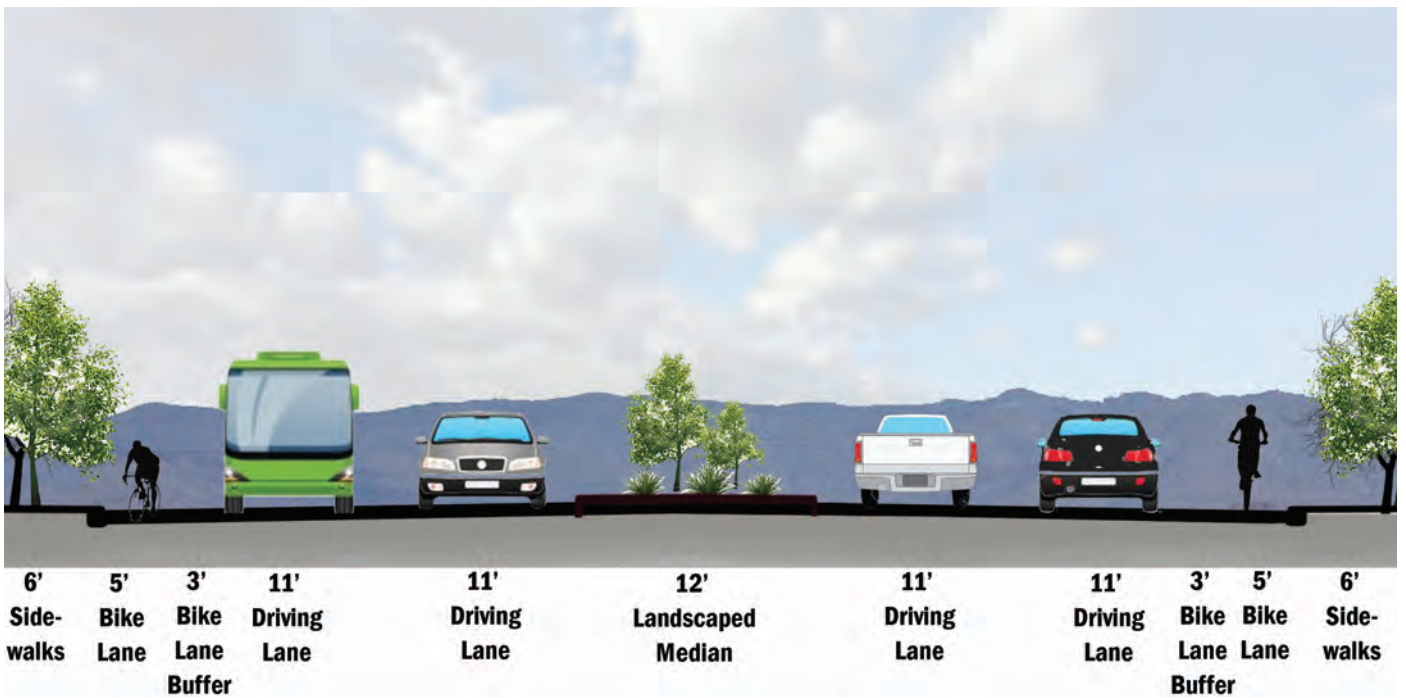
Planned Bridge Boulevard Typical Cross Section Design
